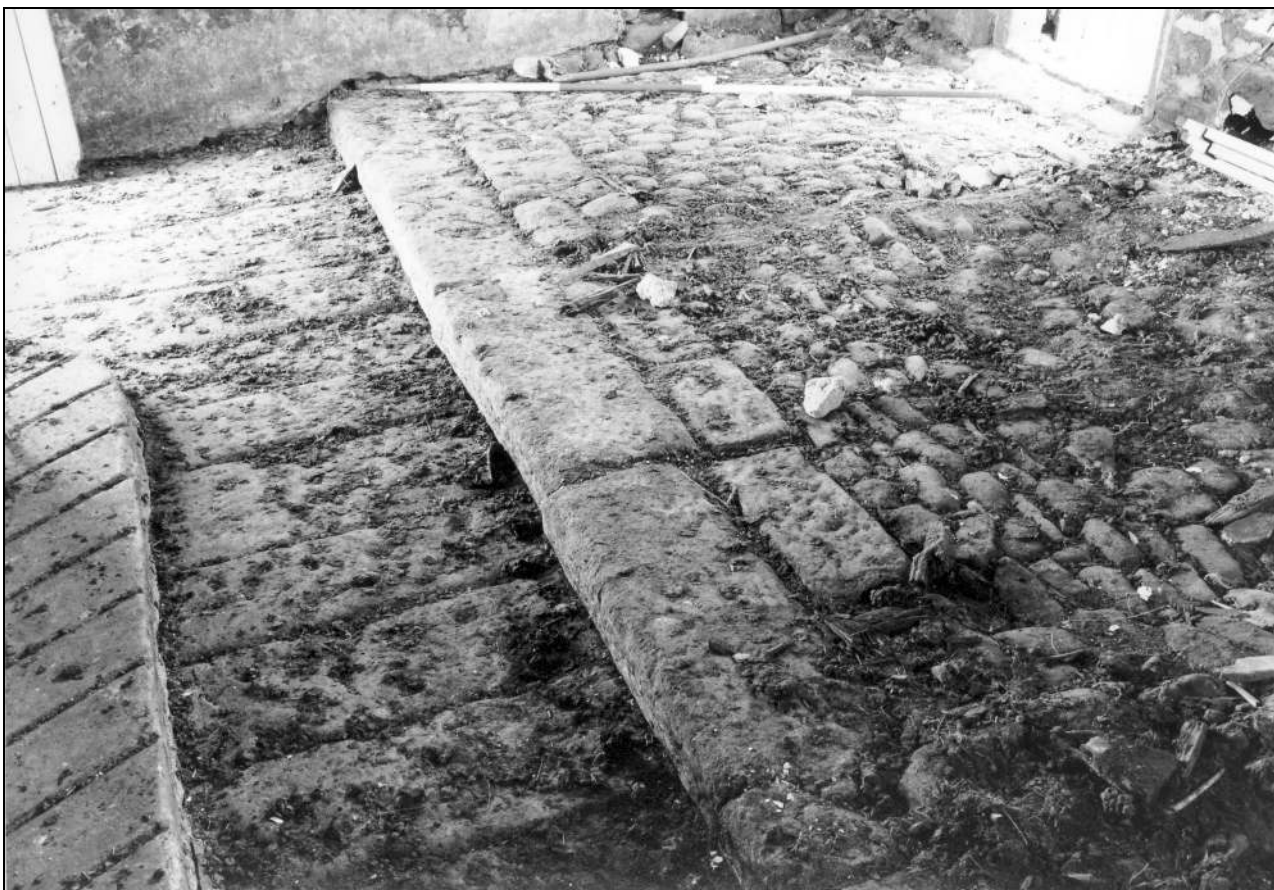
Detail of floor in stable, from the north-east (film 4, frame 7)
